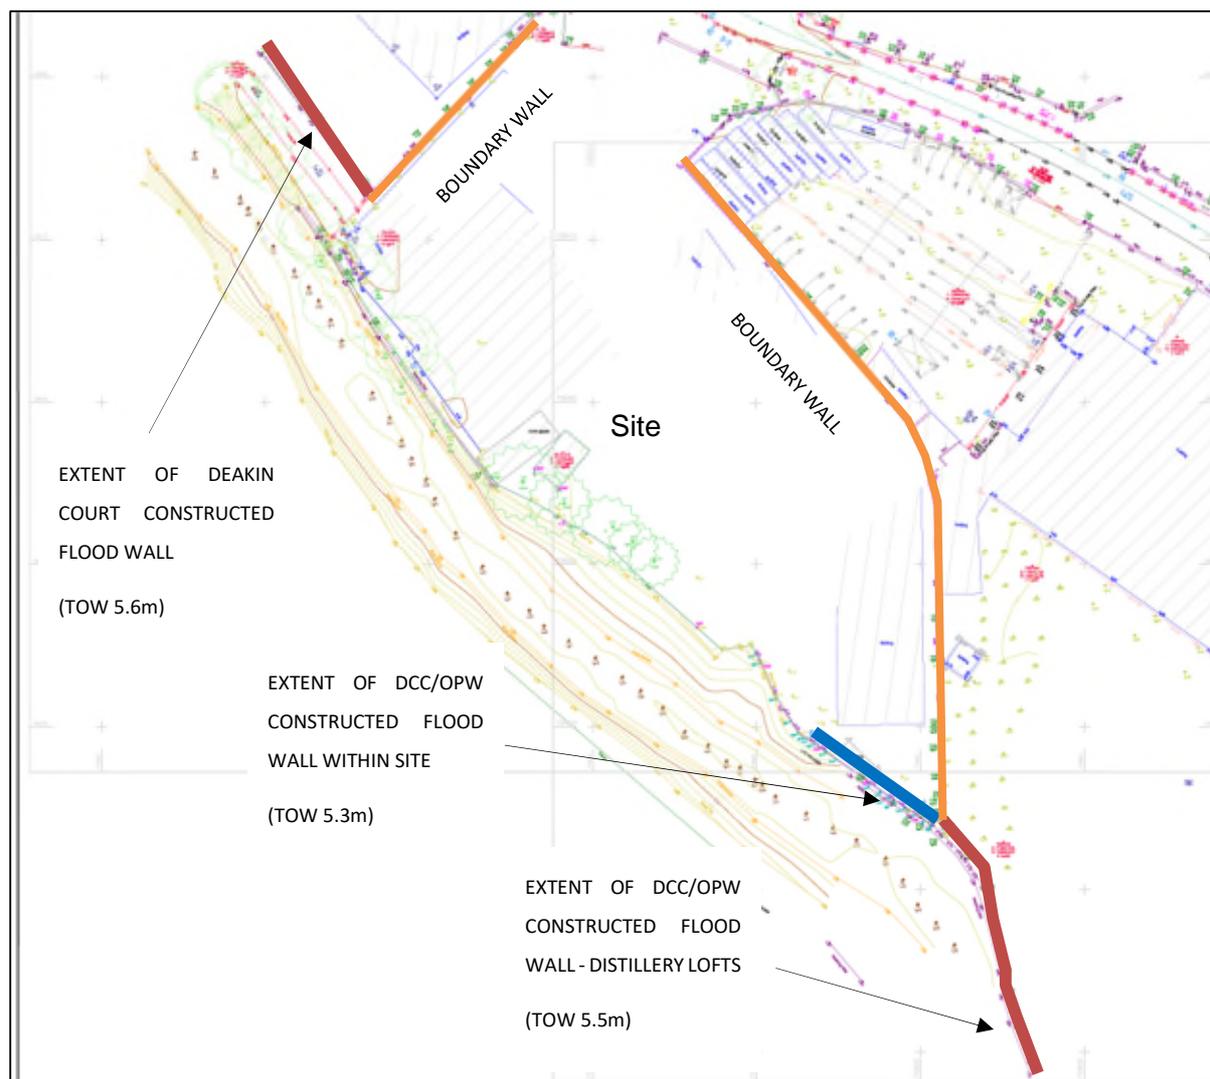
Existing Flood Defence Walls indicated on Topographical Site Survey by Murphy Surveys (Oct 2021)
